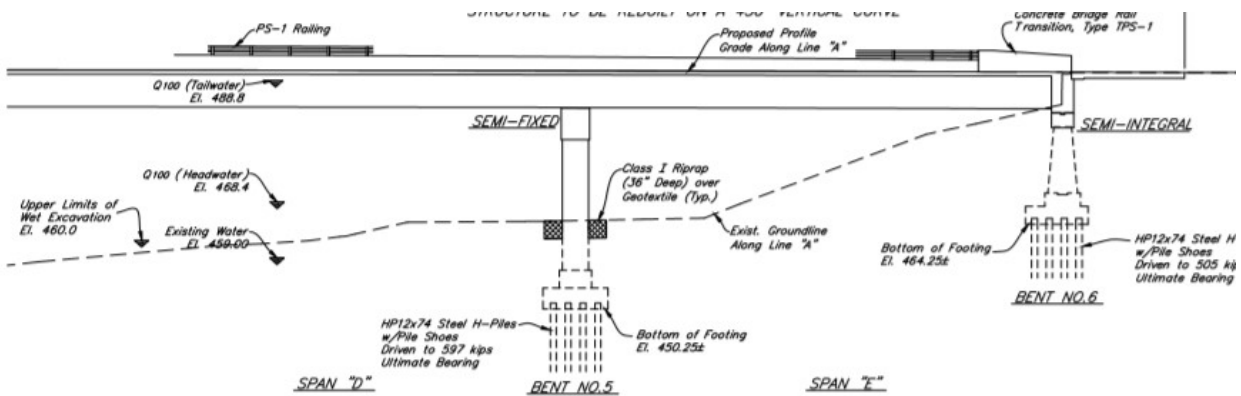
Elevation View of the Bridge—Span 4 and 5 (NBI 18790) (2014)
